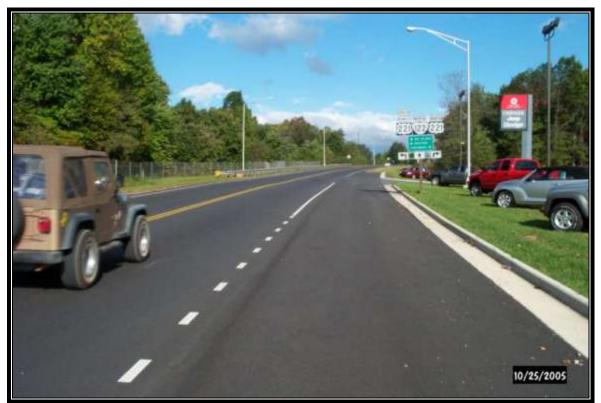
Segment 6 (North of Shady Knoll Avenue to South of Forest Road)
